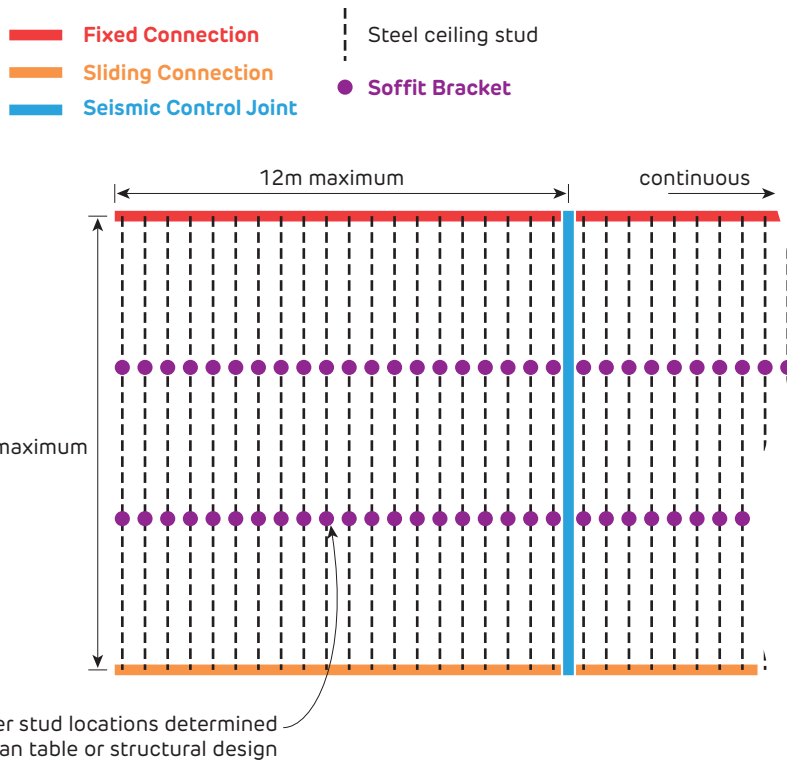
Stud Ceiling Type A4 - Fixed / Sliding
